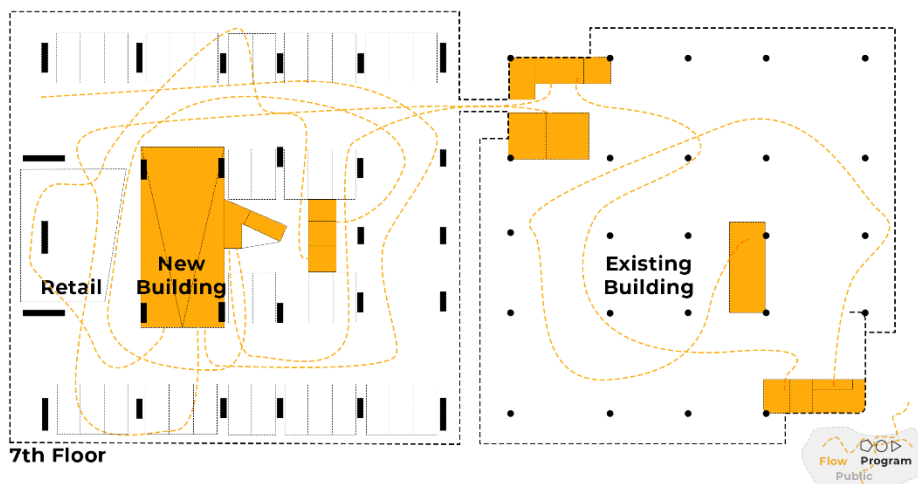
7th Floor plan, showing the flow in 1111 Lincoln Road.
